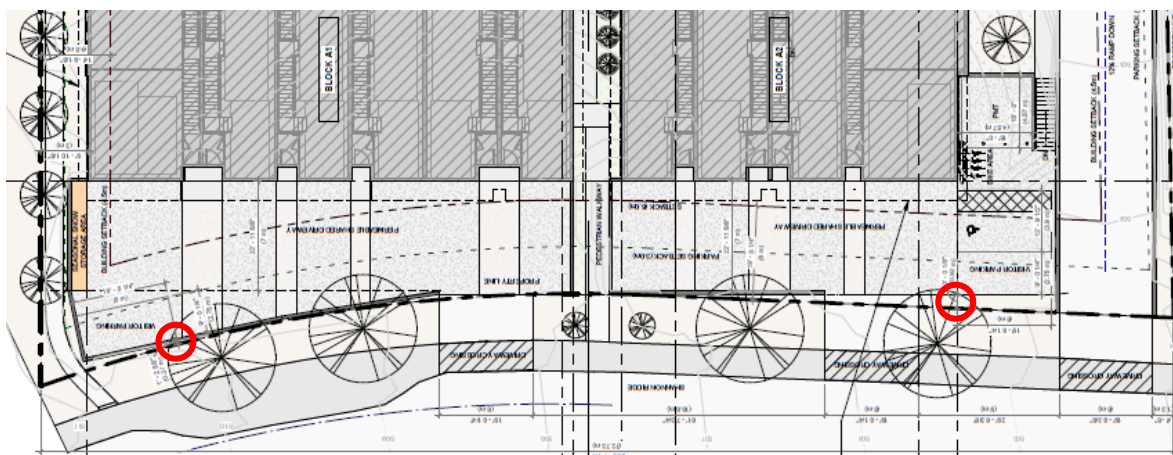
Parking stalls shown adjacent to the front parcel boundary and screened from Shannon Ridge Drive by landscaping in the right of way.
